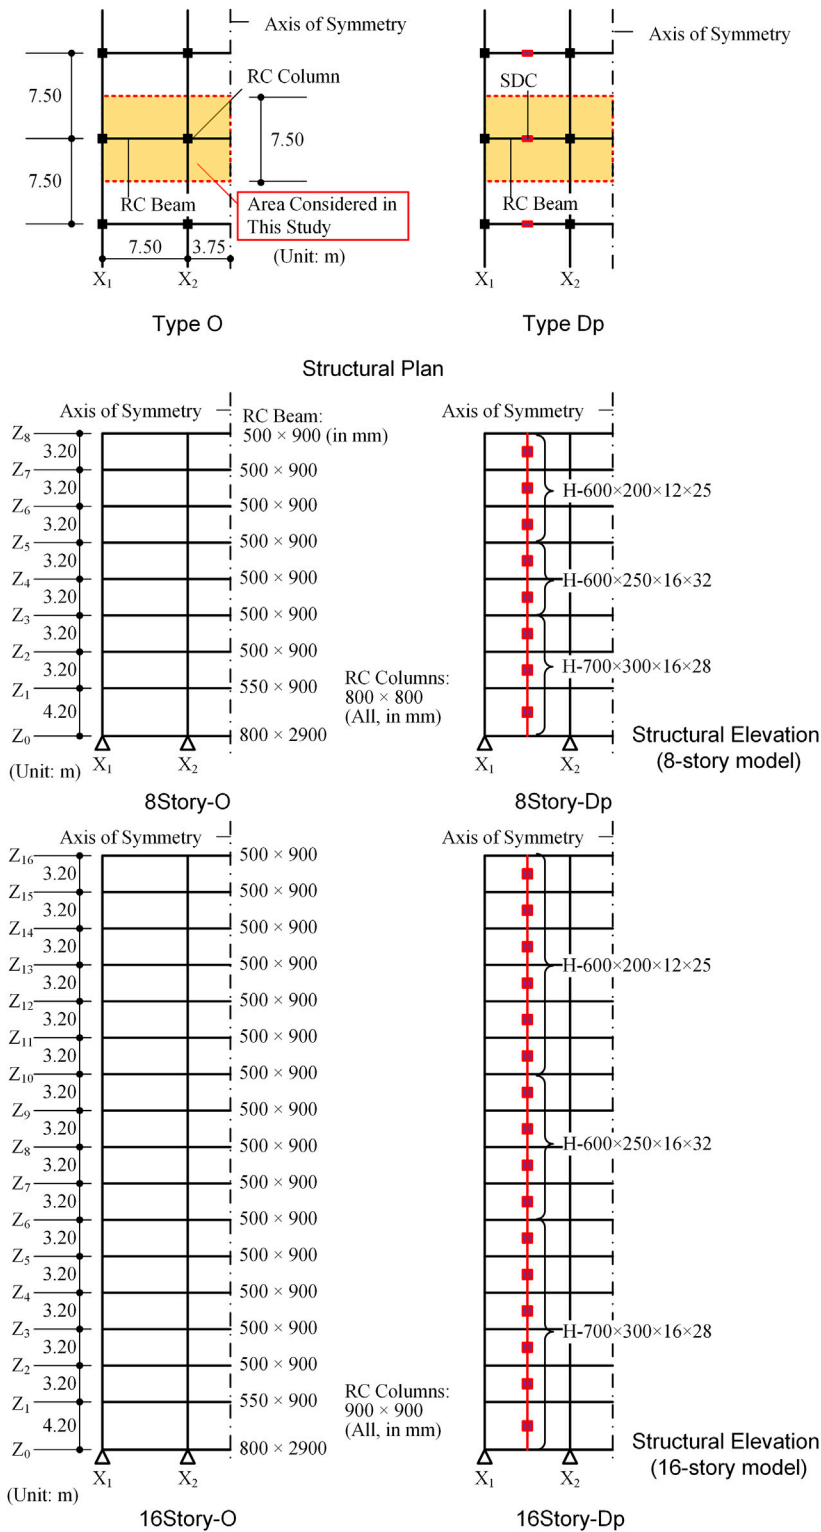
Simplified structural plan and elevation of RC MRF building model.
